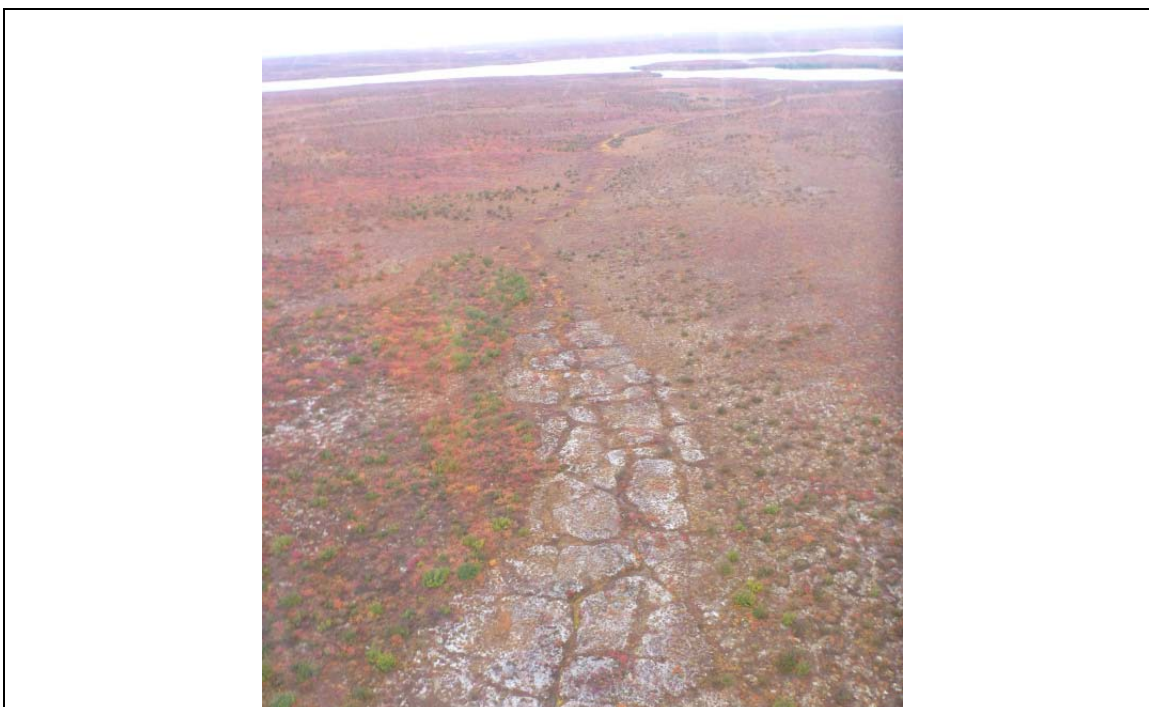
View looking upslope (north) of proposed crossing 28.9 (Sept 2011).
